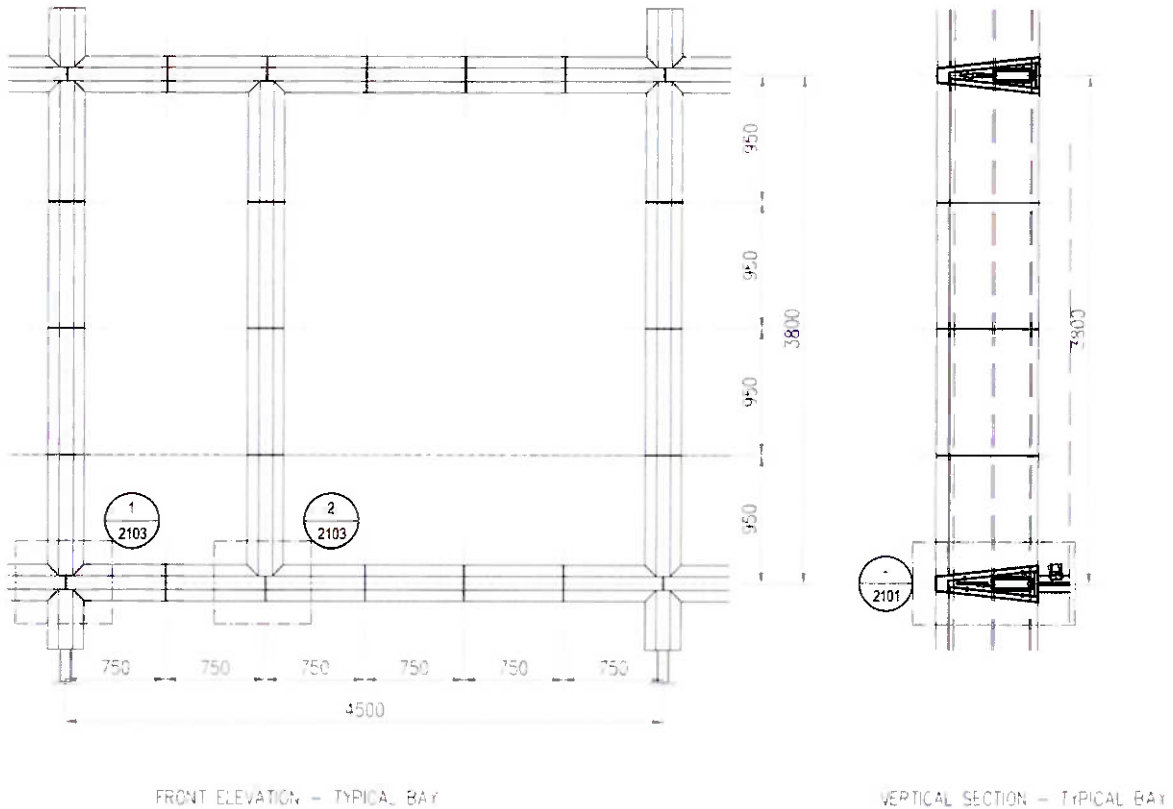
EWS 002 Stone Veil typical bay, elevation and section
